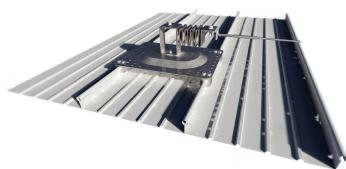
A Baseplate for use on trapezoidal Roof Types
